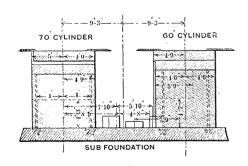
Cross Section Foundations of 3d and 4th Cylinders.
